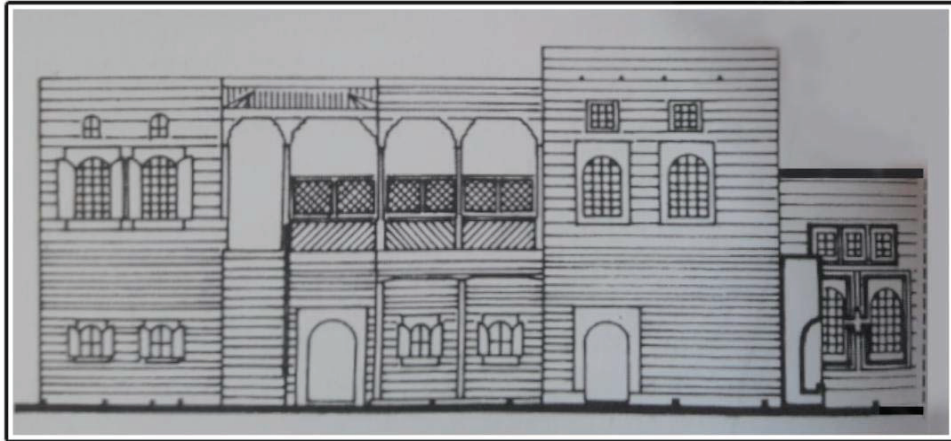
Elevation of the selamlık section of Güpgüpoğlu house.
